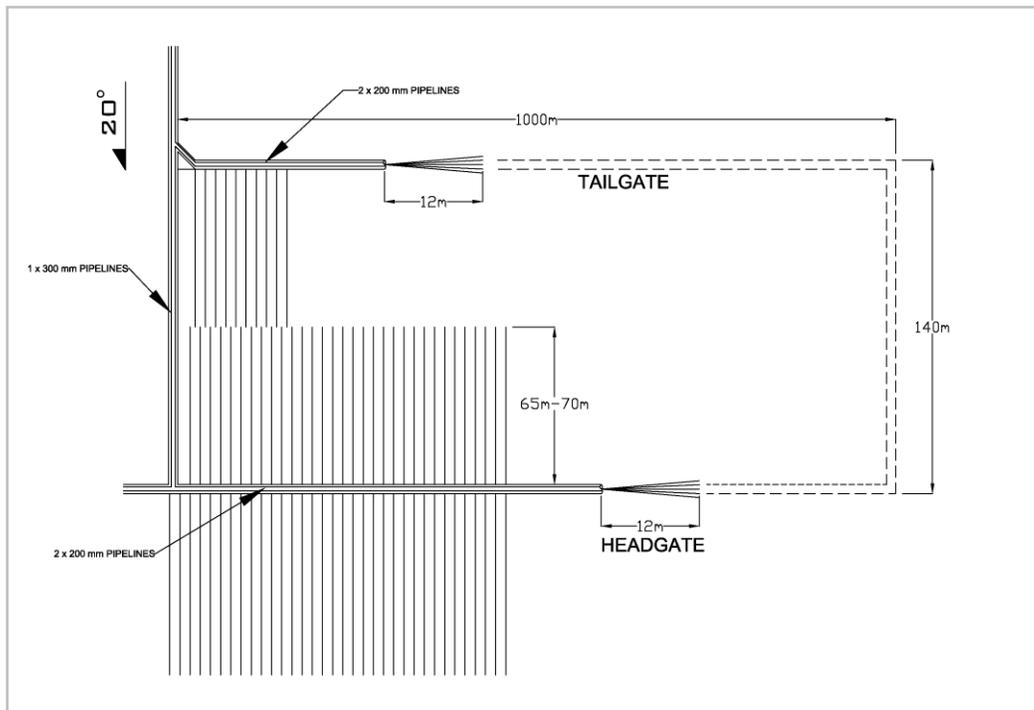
Cross-Panel Drainage implemented during Gateroad Advance at Mine #6.
